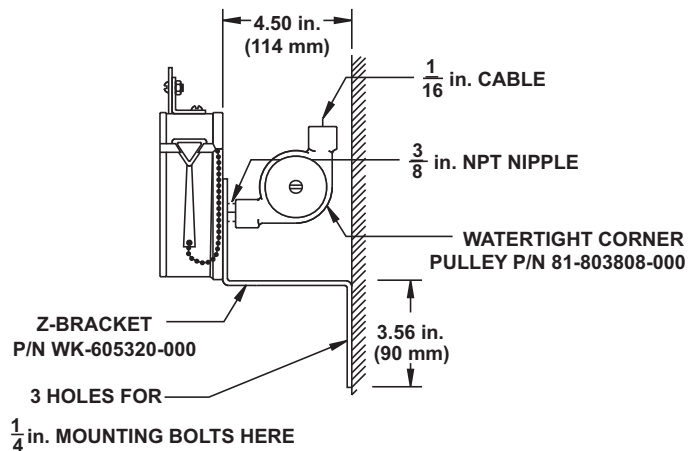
Pull Box, Break Glass used with Z-Bracket
